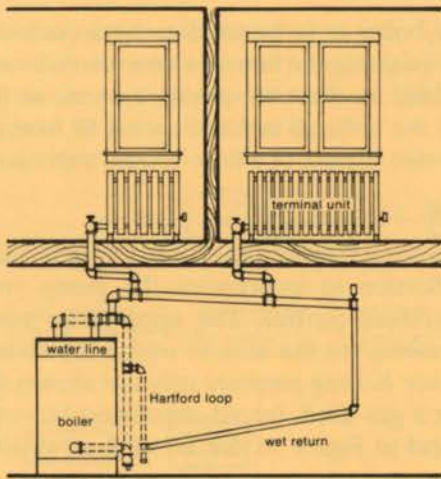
Piping to be removed when converting a one-pipe steam system to a two-pipe hot-water system.
